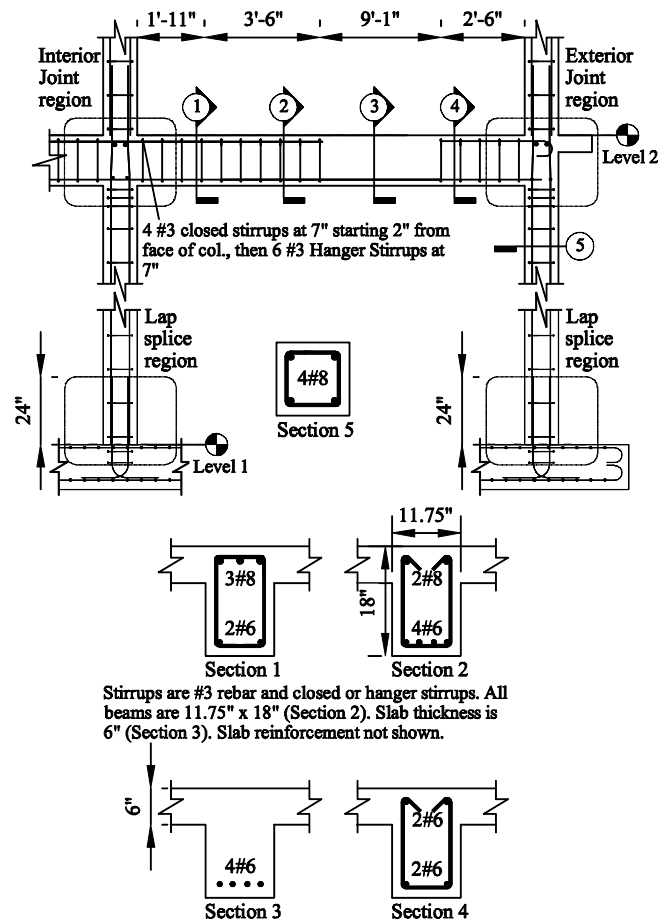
Beam and column geometry and reinforcement details (not to scale).
